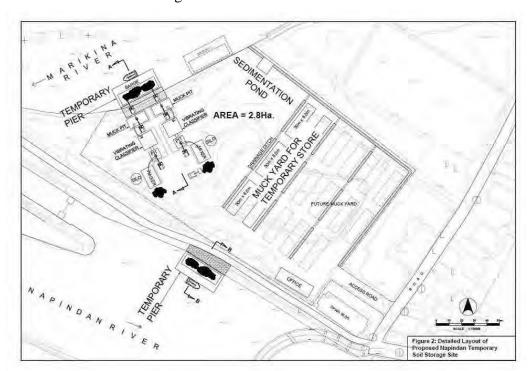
Plan Drawing of Napindan Temporary Soil Storage Site
